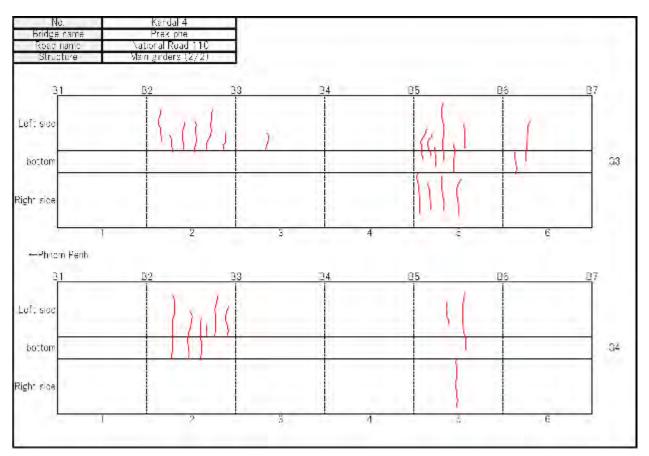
Inspection Sheet (Prek phe: Kandal. Bridge No. 4)
